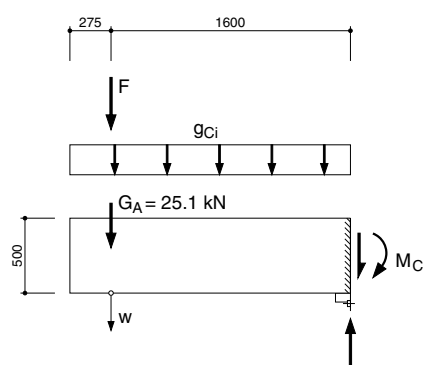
Cantilevers of Slabs C and D. Dimensions in mm.
